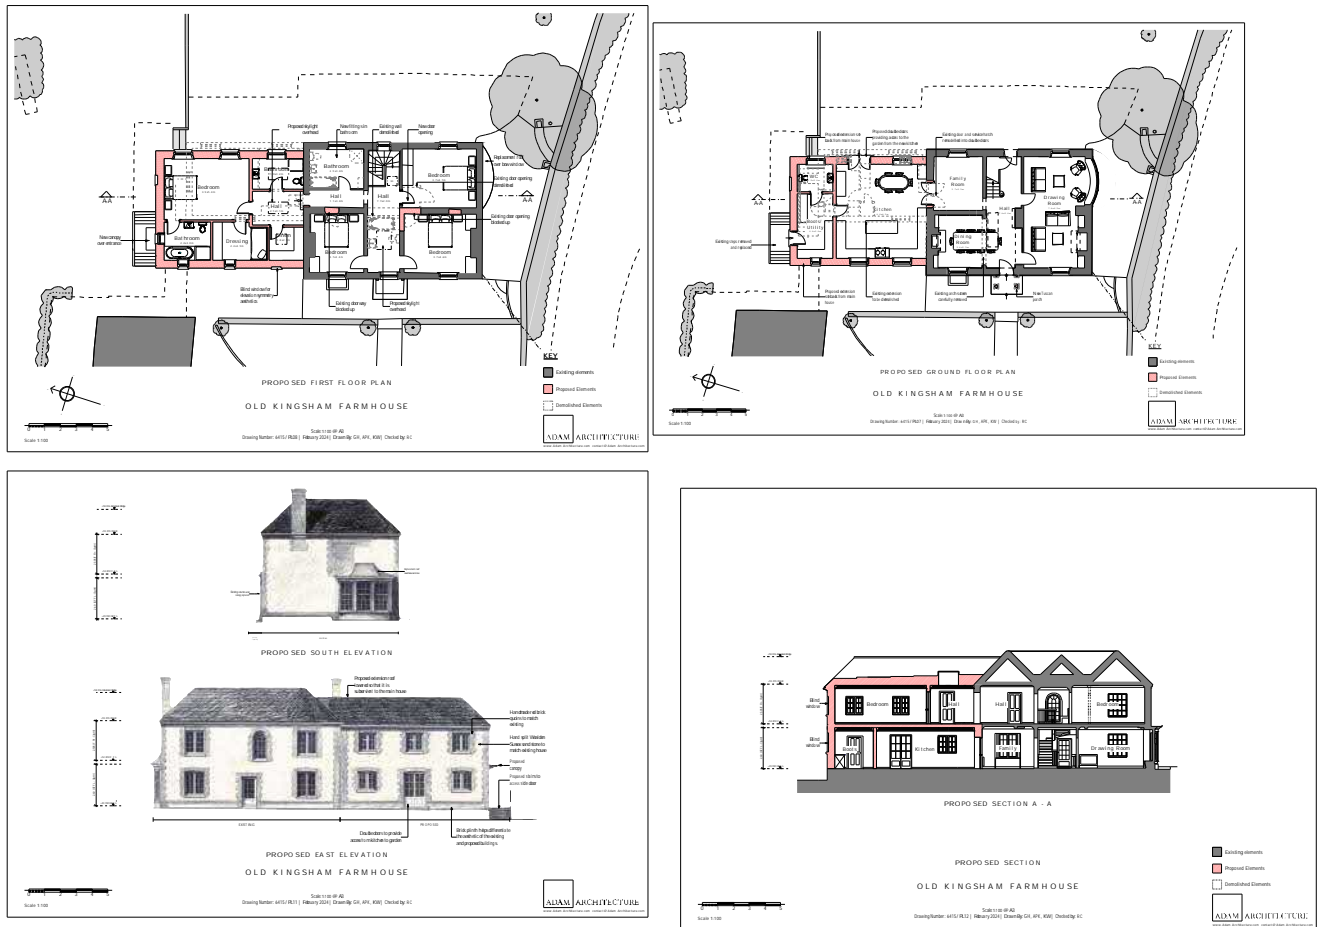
The proposed plans for the extension of Old Kingsham Farm. Plan courtesy of ADAM Architecture, drawing no. 6415.
